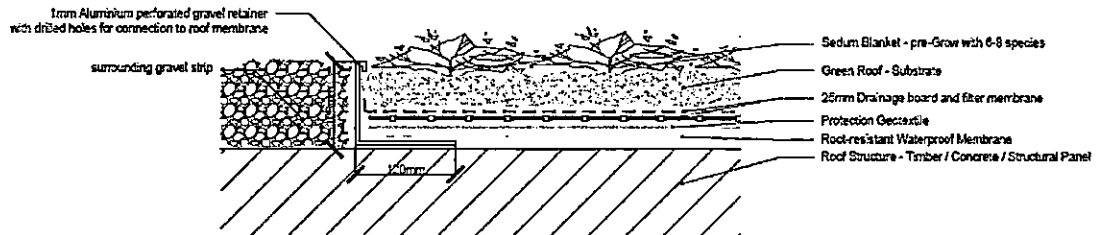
Cross section of Aluminium edge / Green Roof Build
